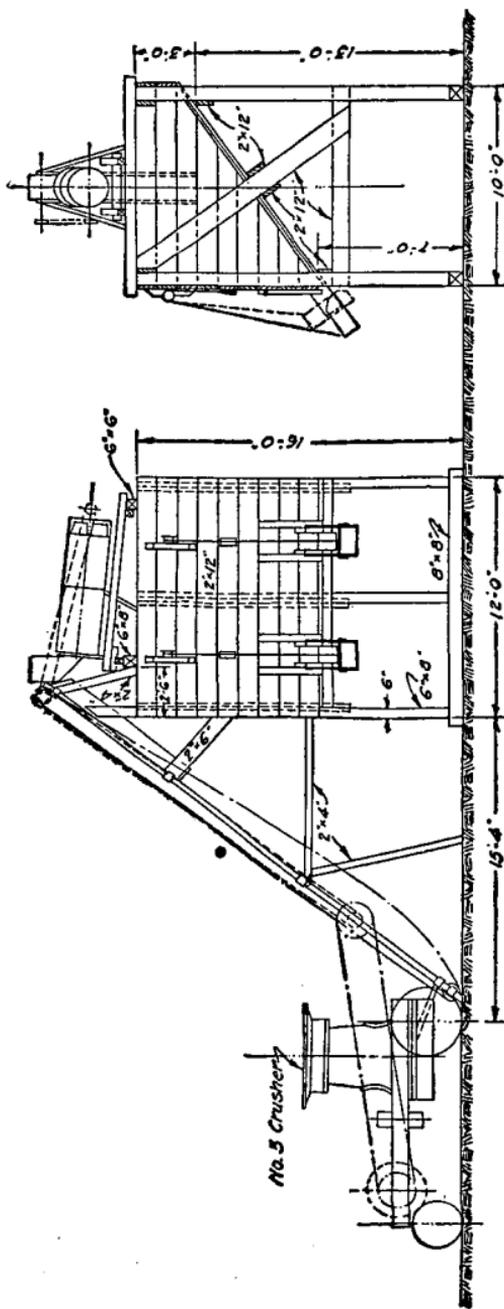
Semiportable crushing plant. (Courtesy Austin Manufacturing Co.)
